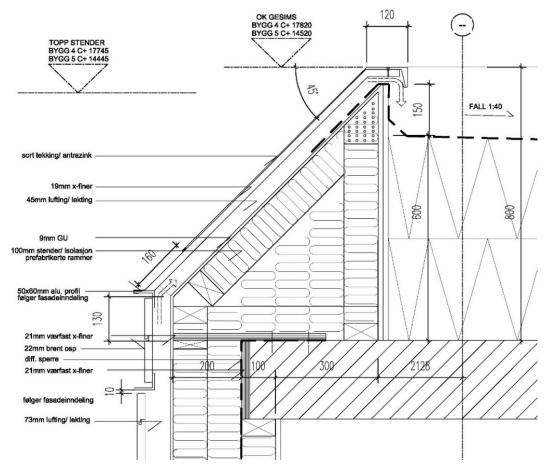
Vertical detail of the parapet. Illustration: Snøhetta.
